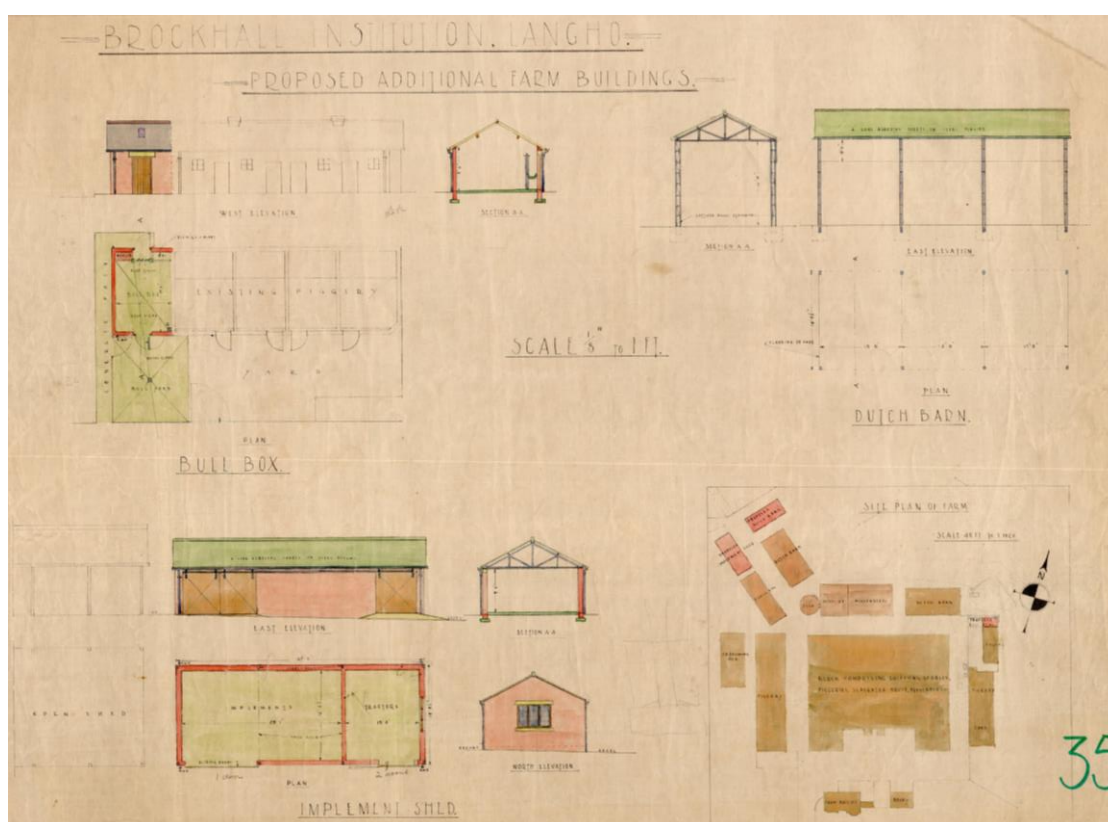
1948 Proposed additional farm buildings with the inset bottom right showing buildings already extant
